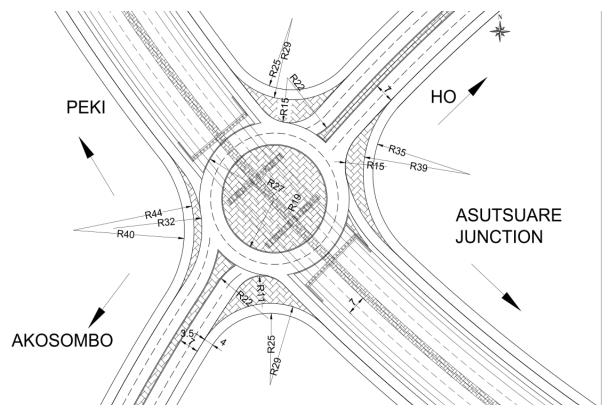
Layout of Asikuma Jn Interchange CH. 67+ 200 of Section 3 Project Road
